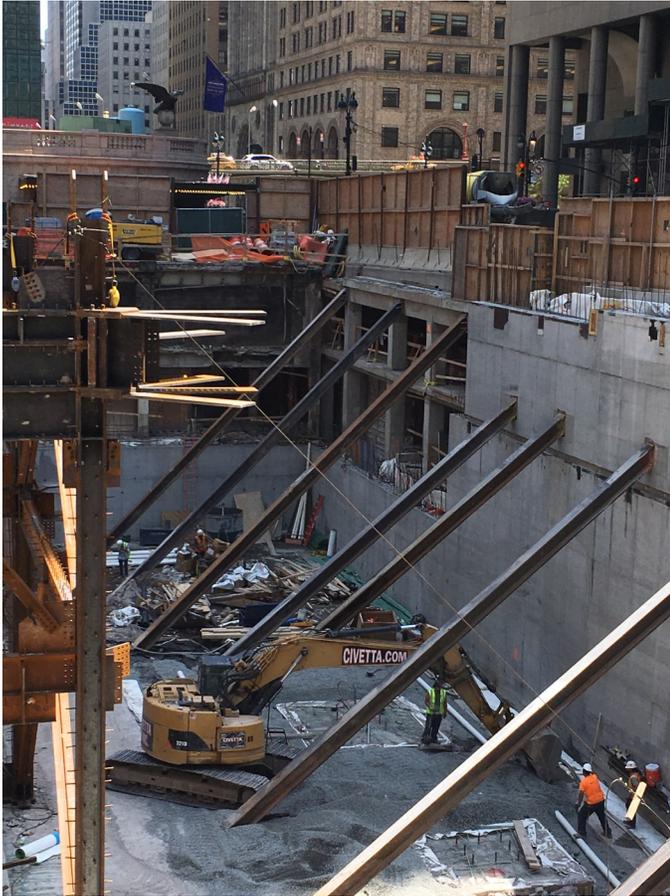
View looking into the southeast corner of the 1 Vanderbilt Avenue tower site, showing the openings into the 42<sup>nd</sup> Street Shuttle mezzanine and platform levels, July 21, 2017.
